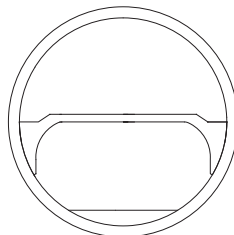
Cross-section of the Barcelona's underground railway Line 9; double-deck circular tunnel.
